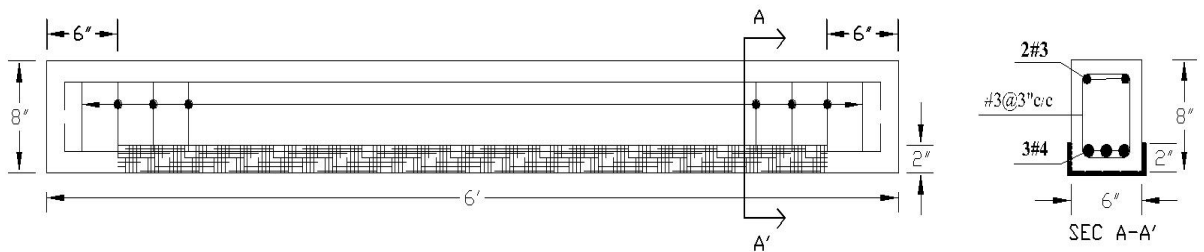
Typical Wrapping Scheme - CFRP at bottom and extended on sides
